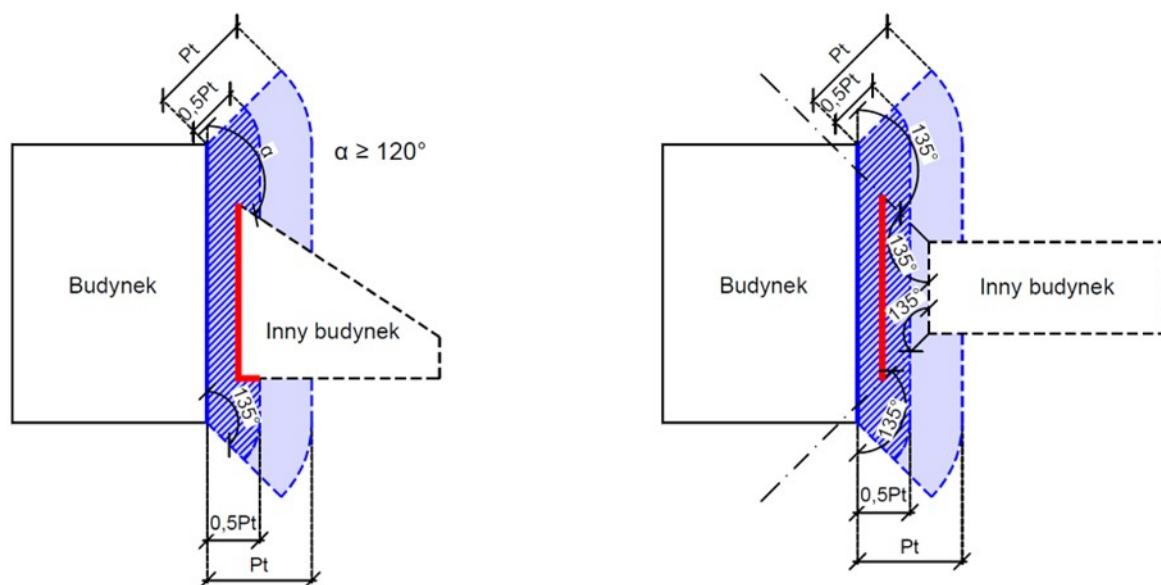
Determination of the strip of land around the exterior wall of the building using the fire separation wall and for the wall at an angle – § 283 para. 11-13 of the Regulation.
